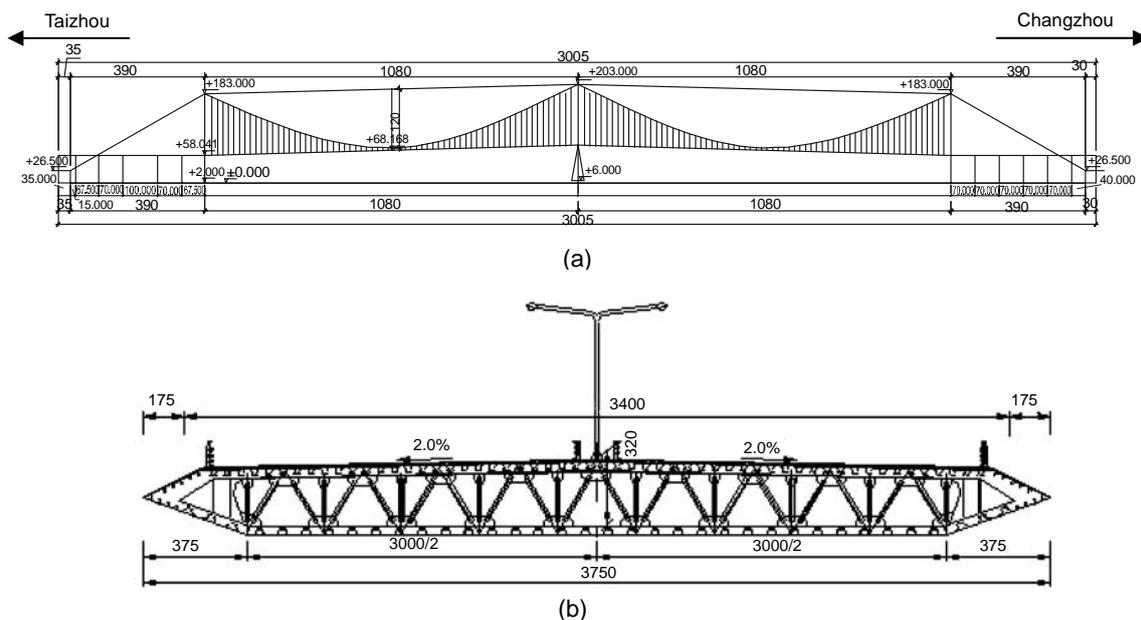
The Taizhou Bridge. (a) Elevation (unit: m); (b) Cross-section of the steel box girder (unit: cm)
